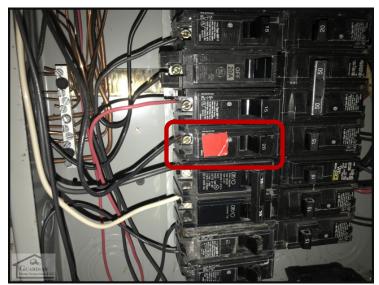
There is one oversized circuit breaker in the main electrical panel (20-amp breaker servicing 14-gauge wire).
